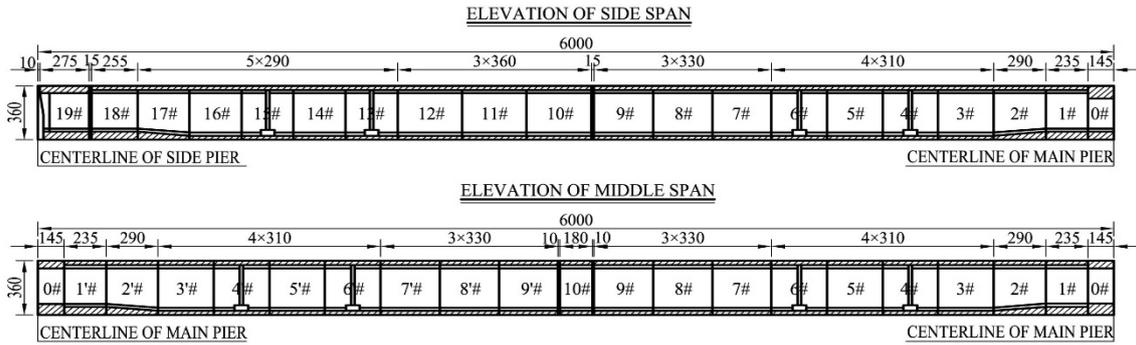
Segment layout of the Leqing Bay Bridge (units: cm): (a) elevation of the side span; and (b) elevation of the middle span
